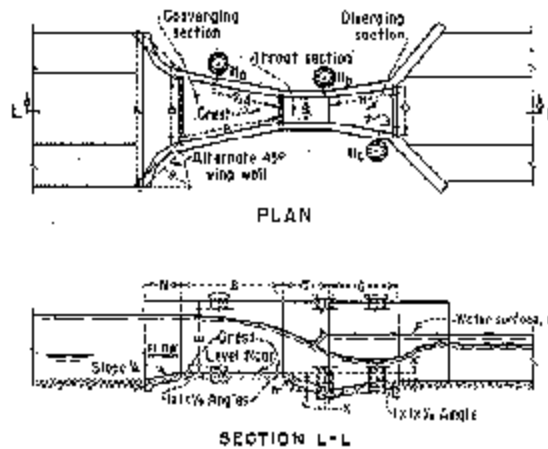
Parshall flume dimensions -- sheet 1 of 2
